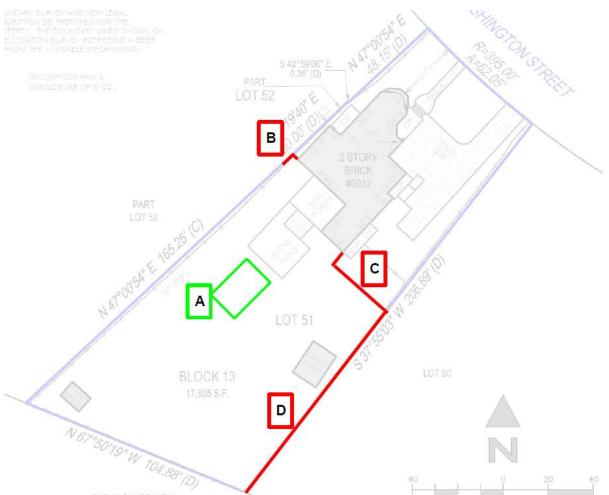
Proposed site plan, with the proposed swimming pool location indicated in green (area A), and the proposed fencing locations indicated in red (areas B, C, and D).
